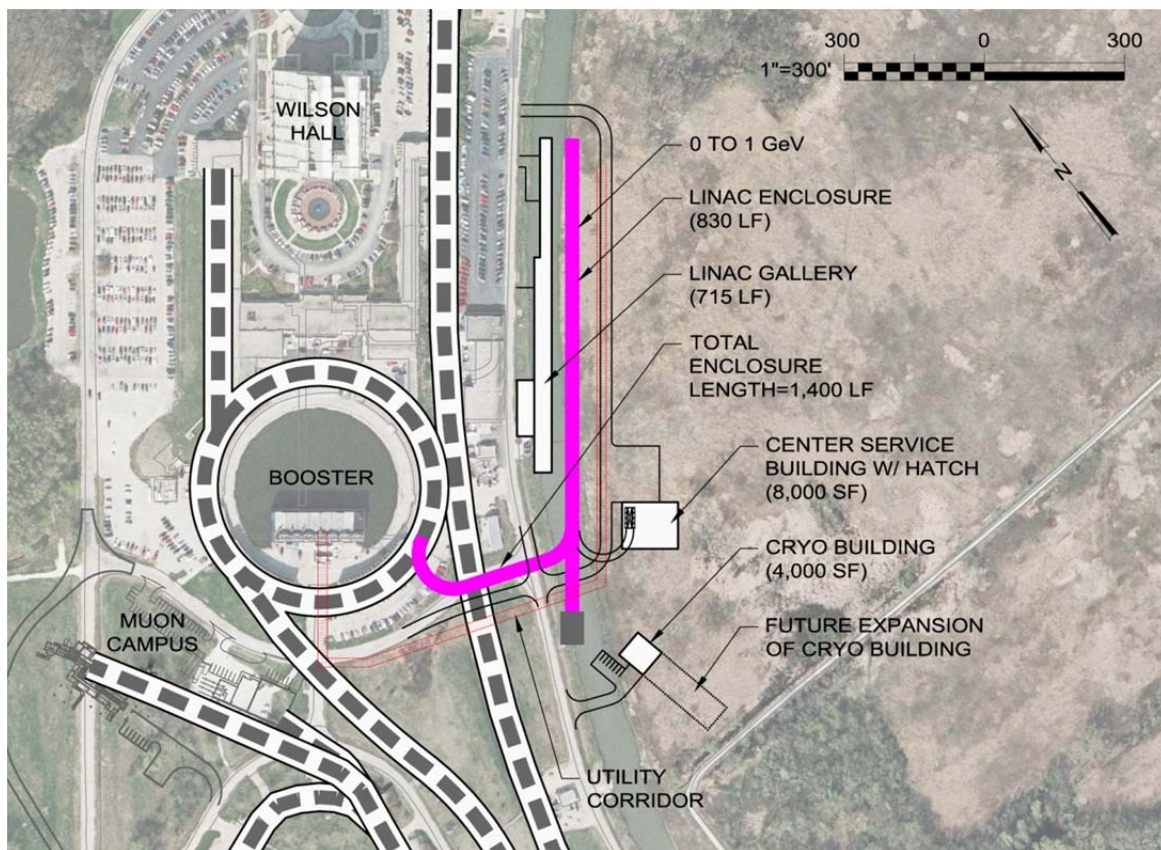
Site layout of PIP- II. New construction includes the linac enclosure, transfer line enclosure, linac gallery, center service building, utility corridor, and cryo building. Dashed areas represent existing or planned underground enclosures.
